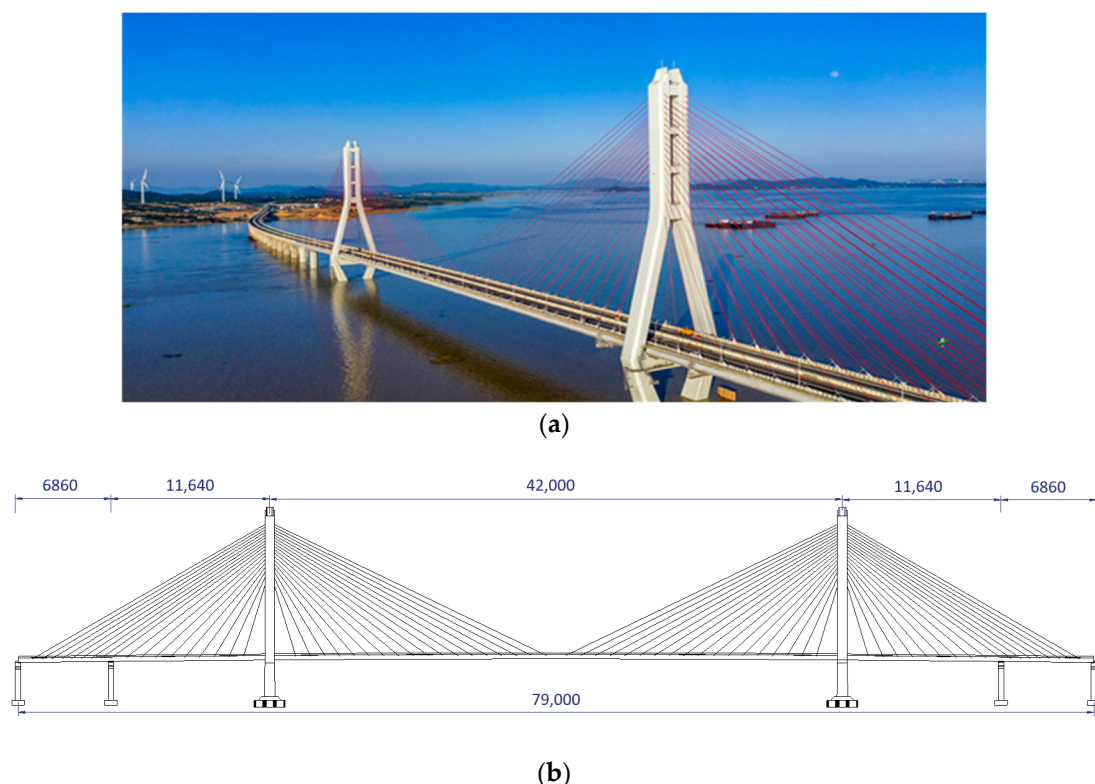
The Poyang Lake Second Bridge: (a) bridge photograph; (b) main bridge layout plan (unit: cm).
